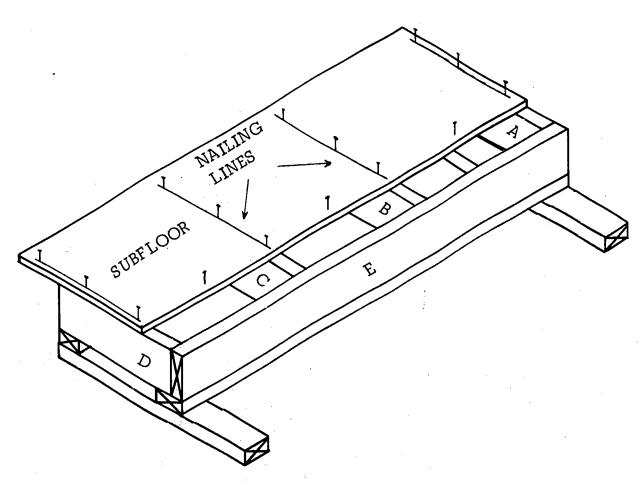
C-5. Assembly Detail of Wood Floor Structure
